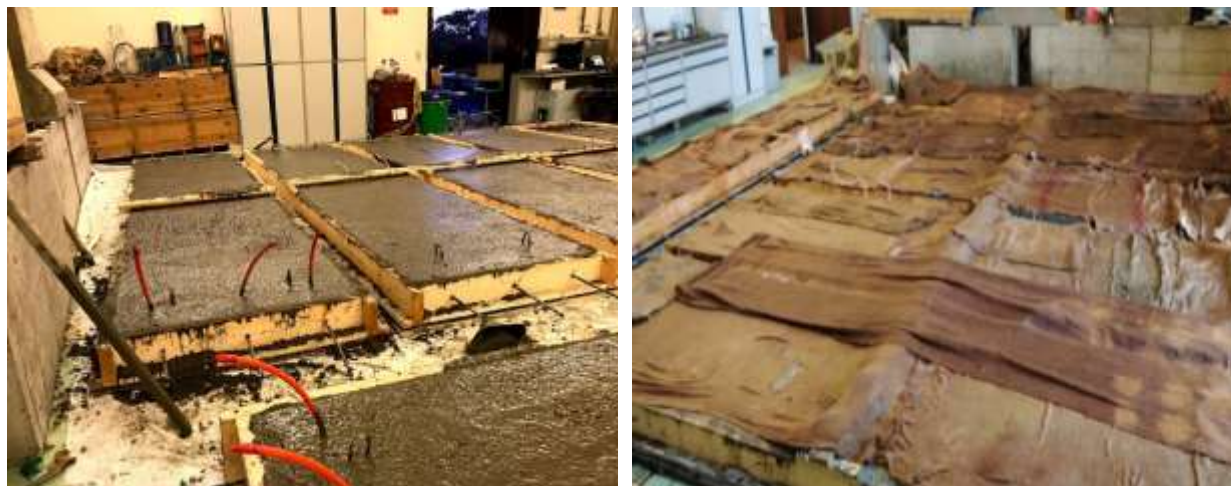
Post-tension Slab specimens after concrete casting (left) and post-tension slab specimens covered with polyethylene sheets for curing (right).
